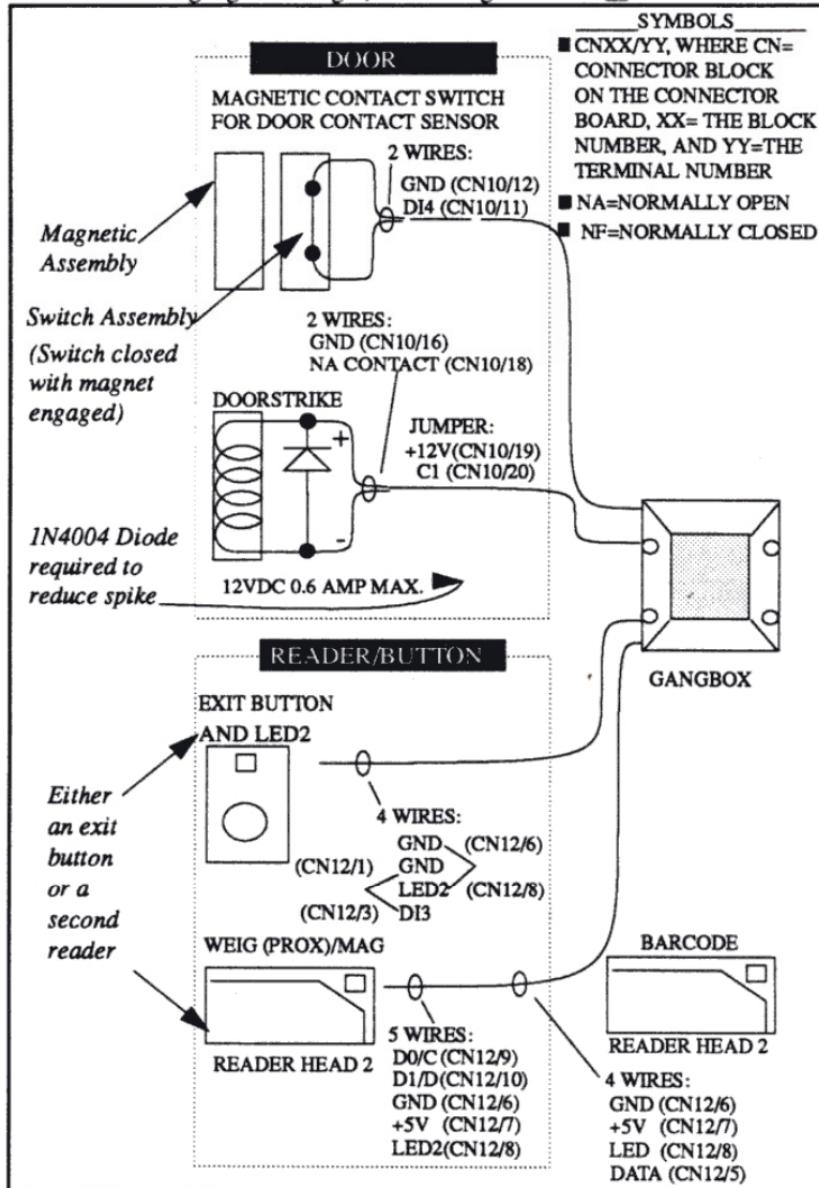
F: DEVICE WIRING - DOOR/READER
